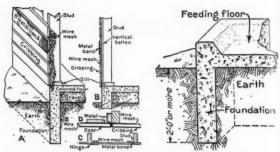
(Left) Detail of corncrib construction. A, section through wall. B, section through door, which is made of cribbing on vertical battens. (The metal band on the wall extends across the door, but is cut and bent inward at the edges of the door.) C, plan of door. D, enlarged detail of jamb at closing side of door. Fig. 5 (Right) A concrete curtain wall or apron under a feeding floor for hogs prevents raveling of earth and subsequent breaking of the slab, as well as the harboring of rats
